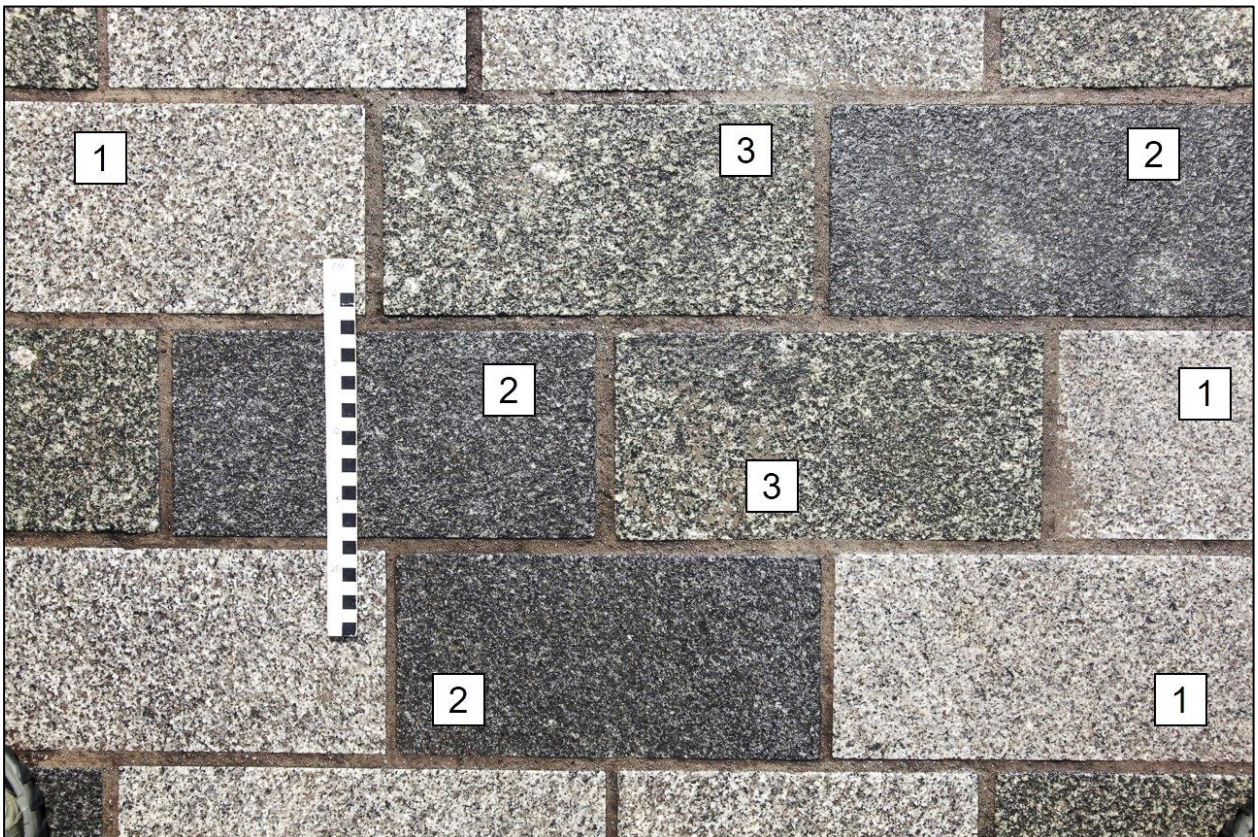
Modern setted street at junction of St John Street and Holyrood Road
